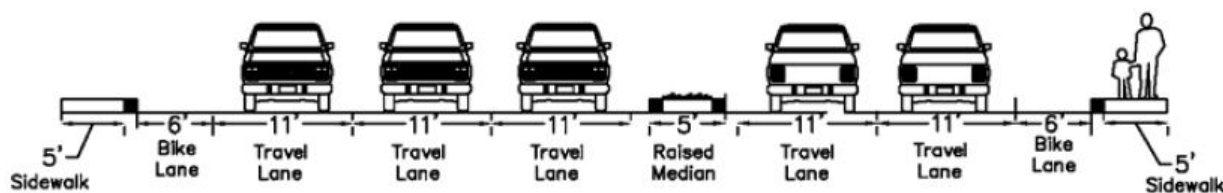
Cross-section of I-89 Exit 14 Bridge (US Route 2 Corridor Transportation Management Plan, 2007)
